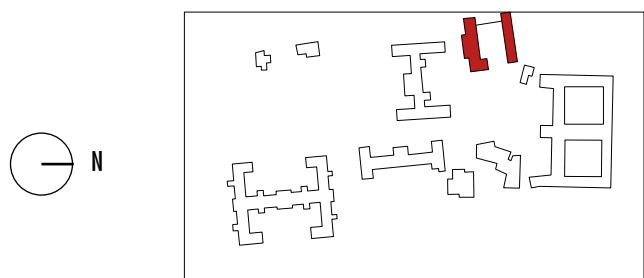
Ground floor plan of Sisters' House I,II, Laundry room, distribution project.
